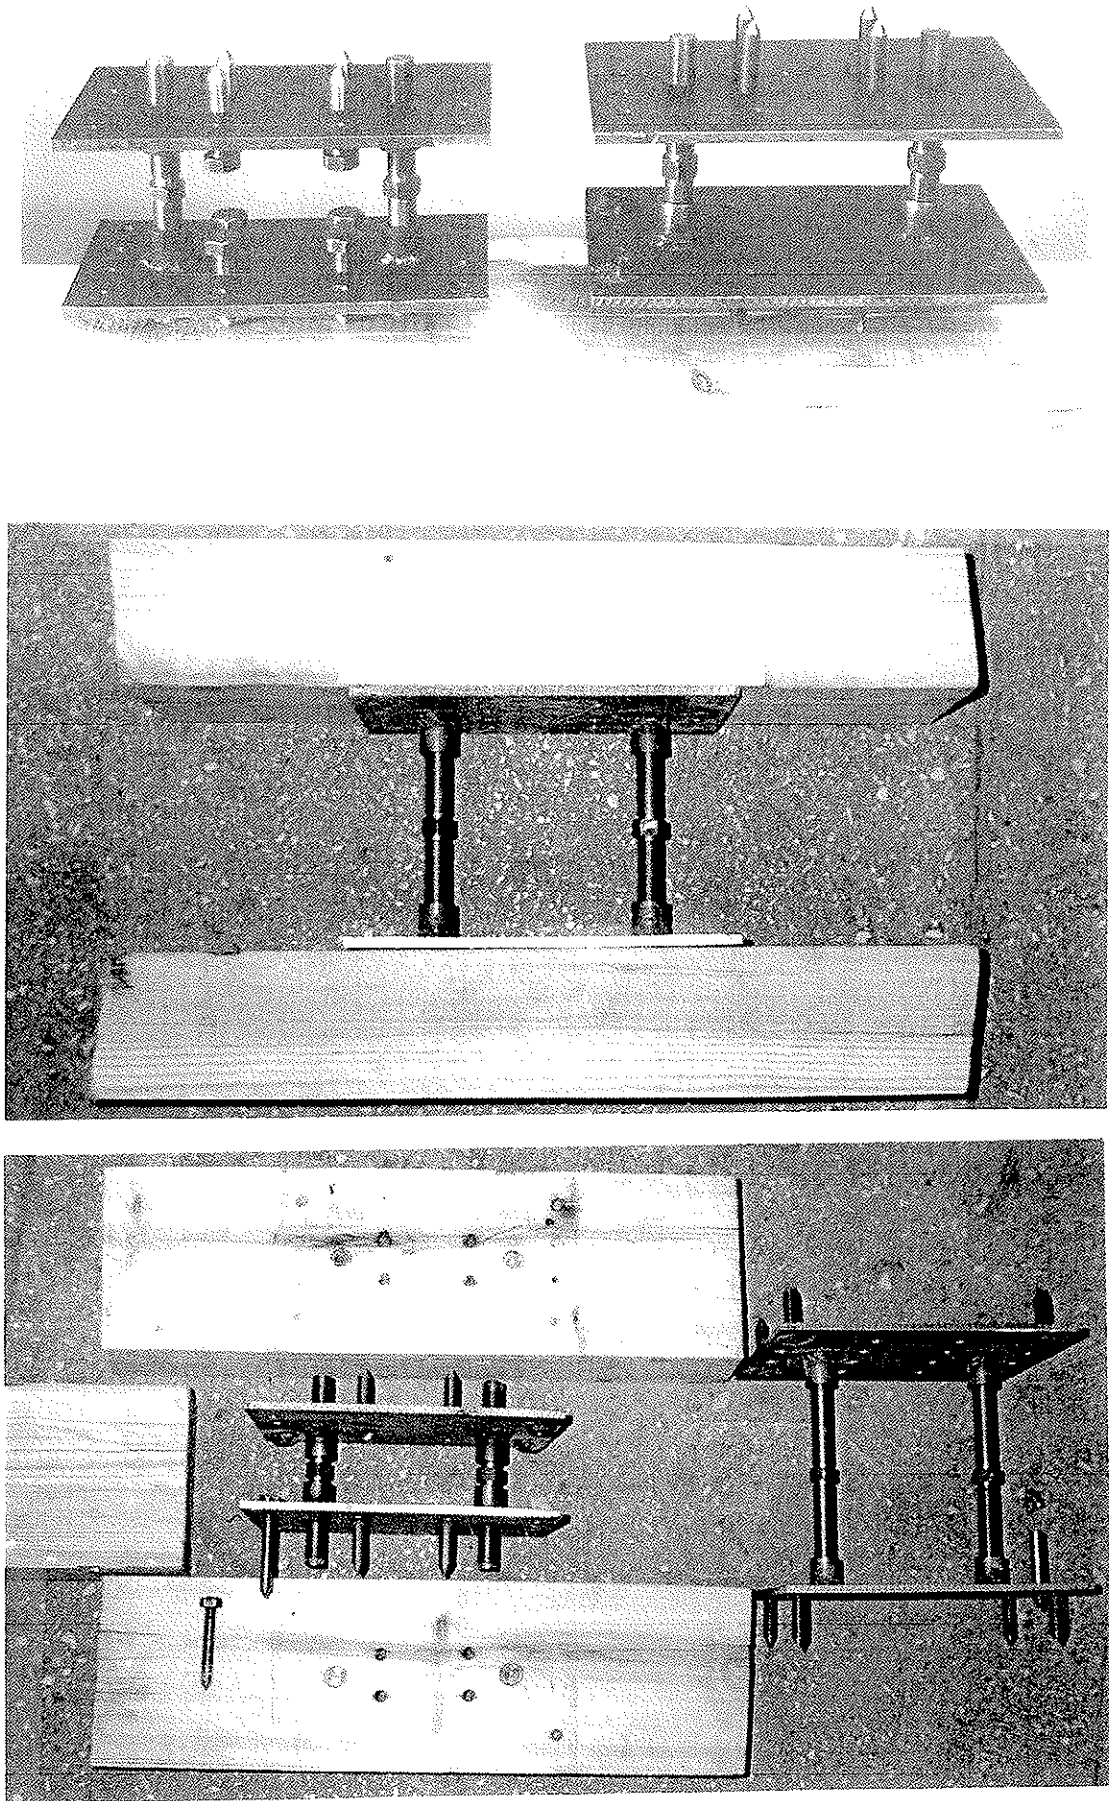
Top: Height-adjustable fastener connecting upper and lower chords of built-up beam, with lagscrews (top left) and pointed pins (top right) to fasten connector to chord members. Center: Assembled connection. Bottom: Connection disassembled after testing for deflection of built-up beam.
